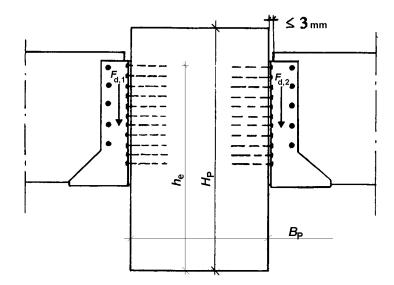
Typical use of Taizhou Homer Joist Hangers.
